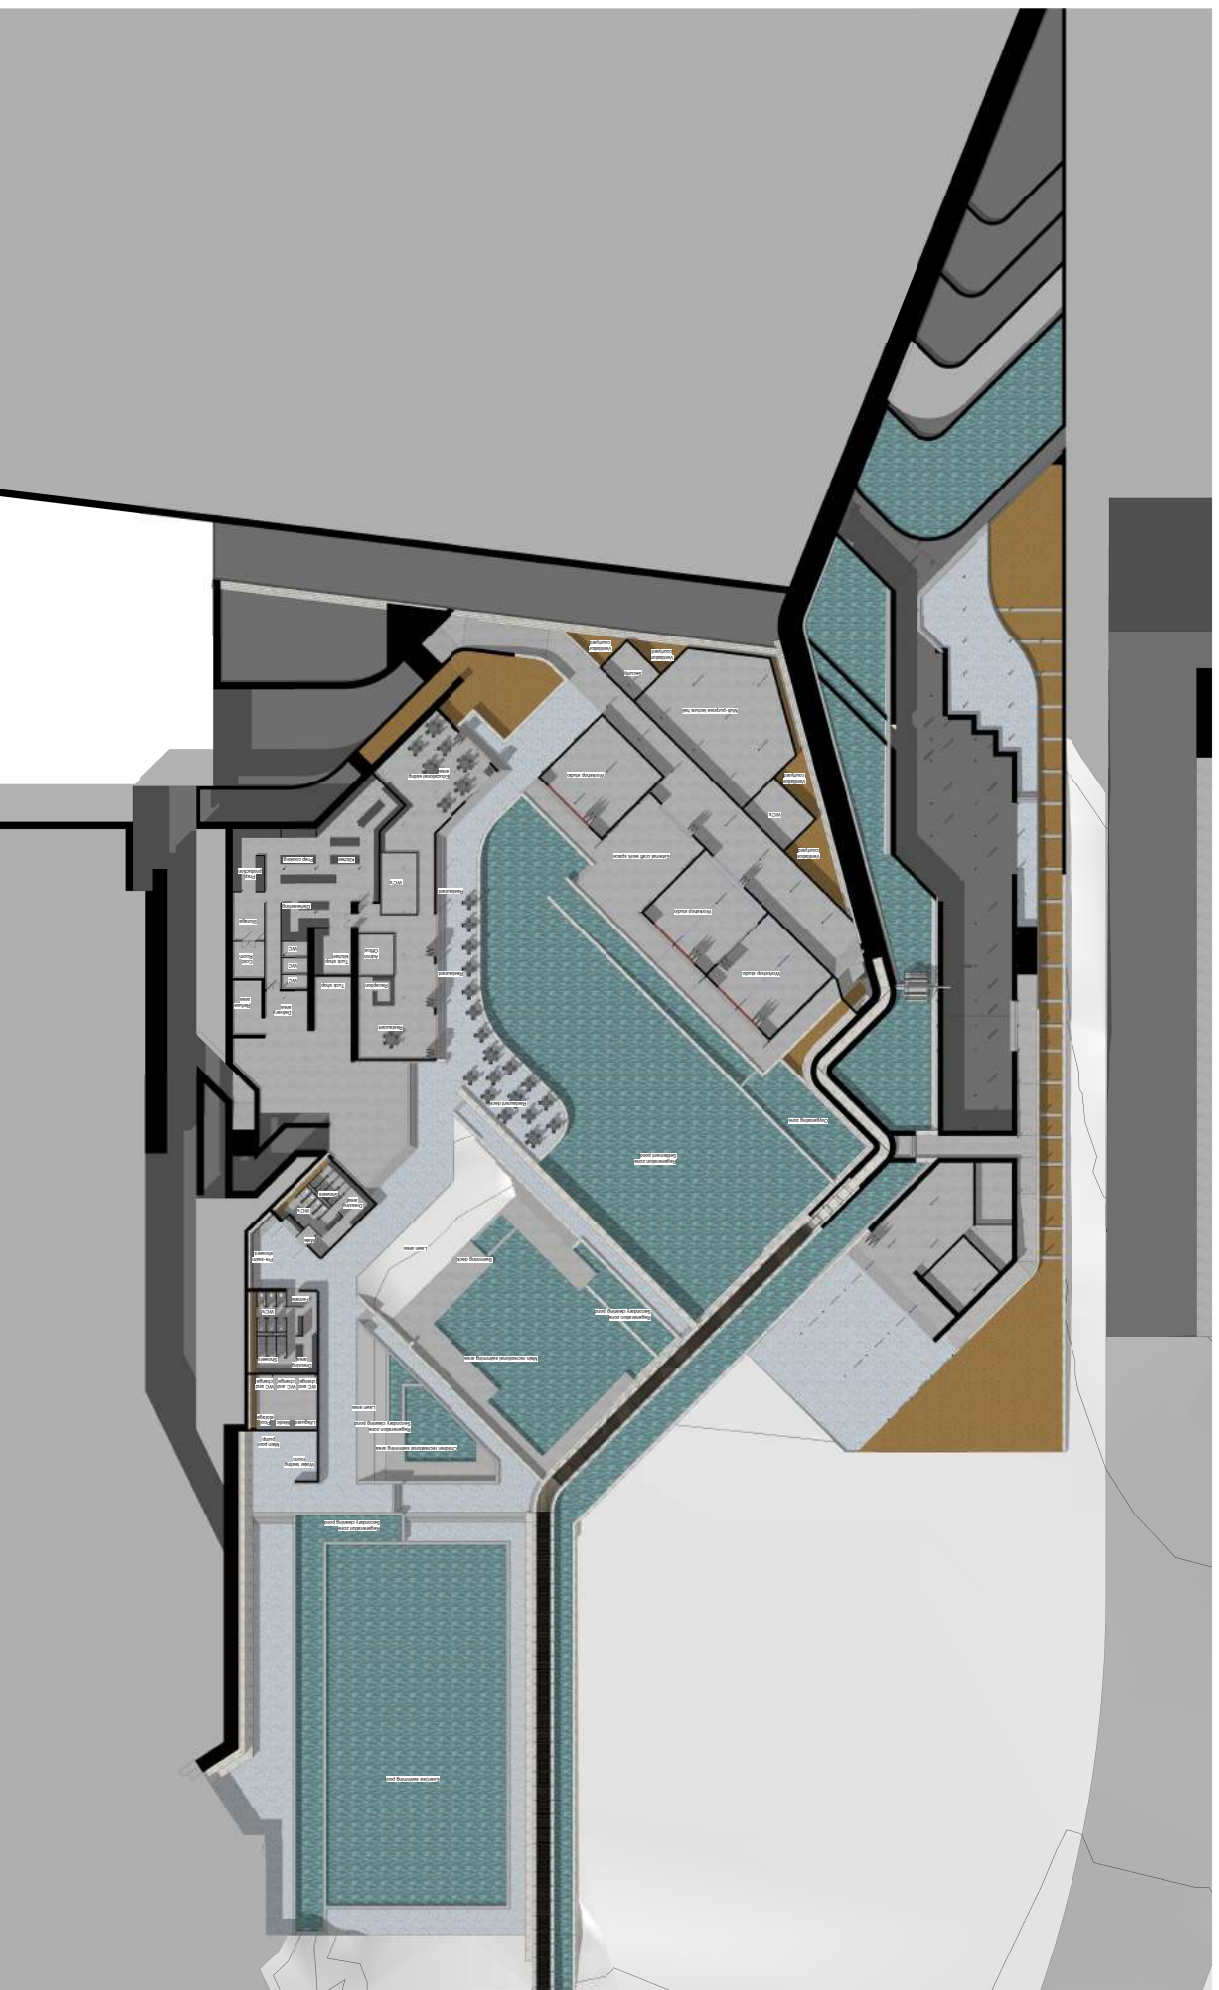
Design development Ground Floor plan (Author, 2019)
